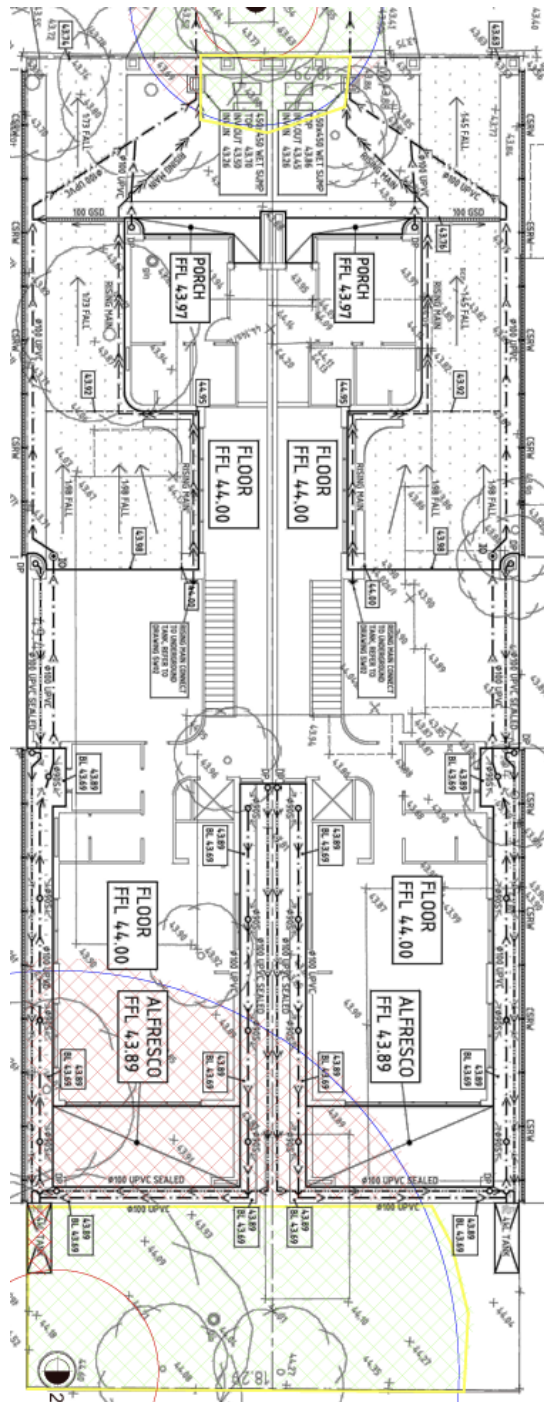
Proposed site plan (Source: Tertiary Tree Consultancy Report).
